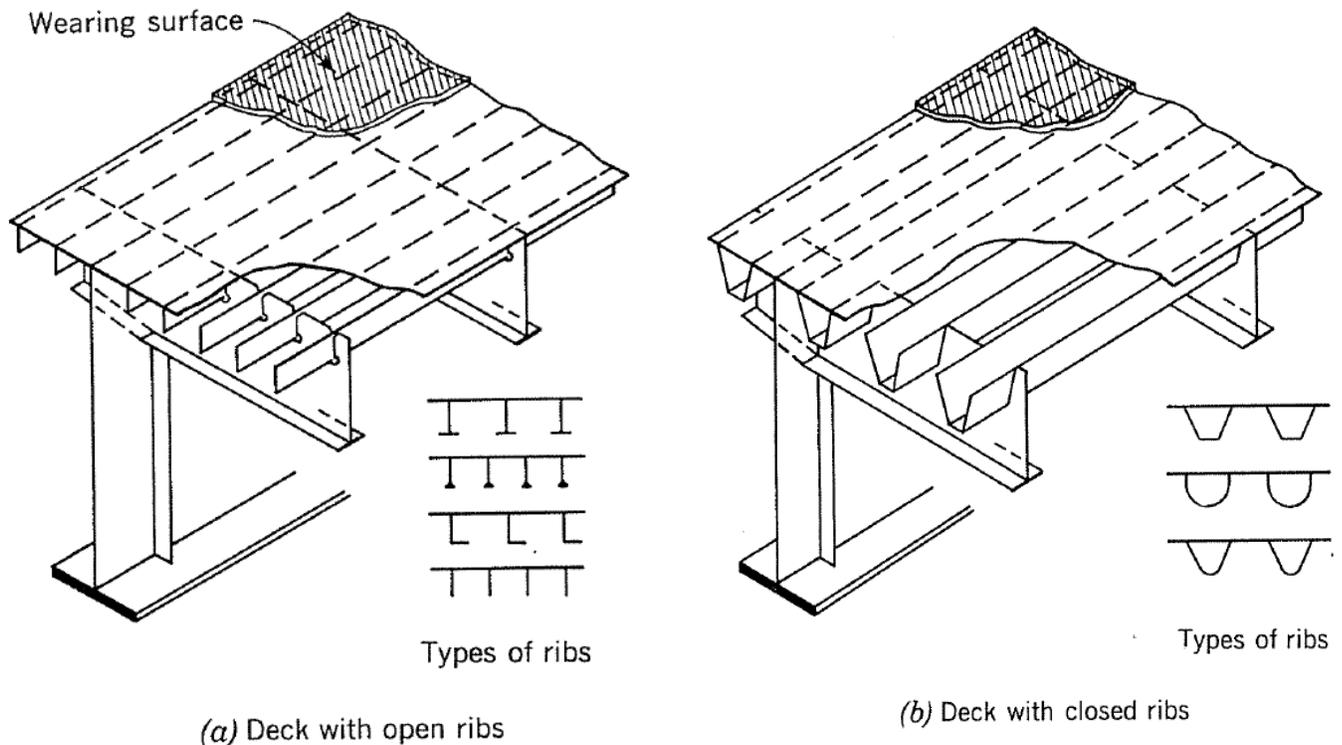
Orthotropic steel deck bridge. (Wolchuk 1963)
